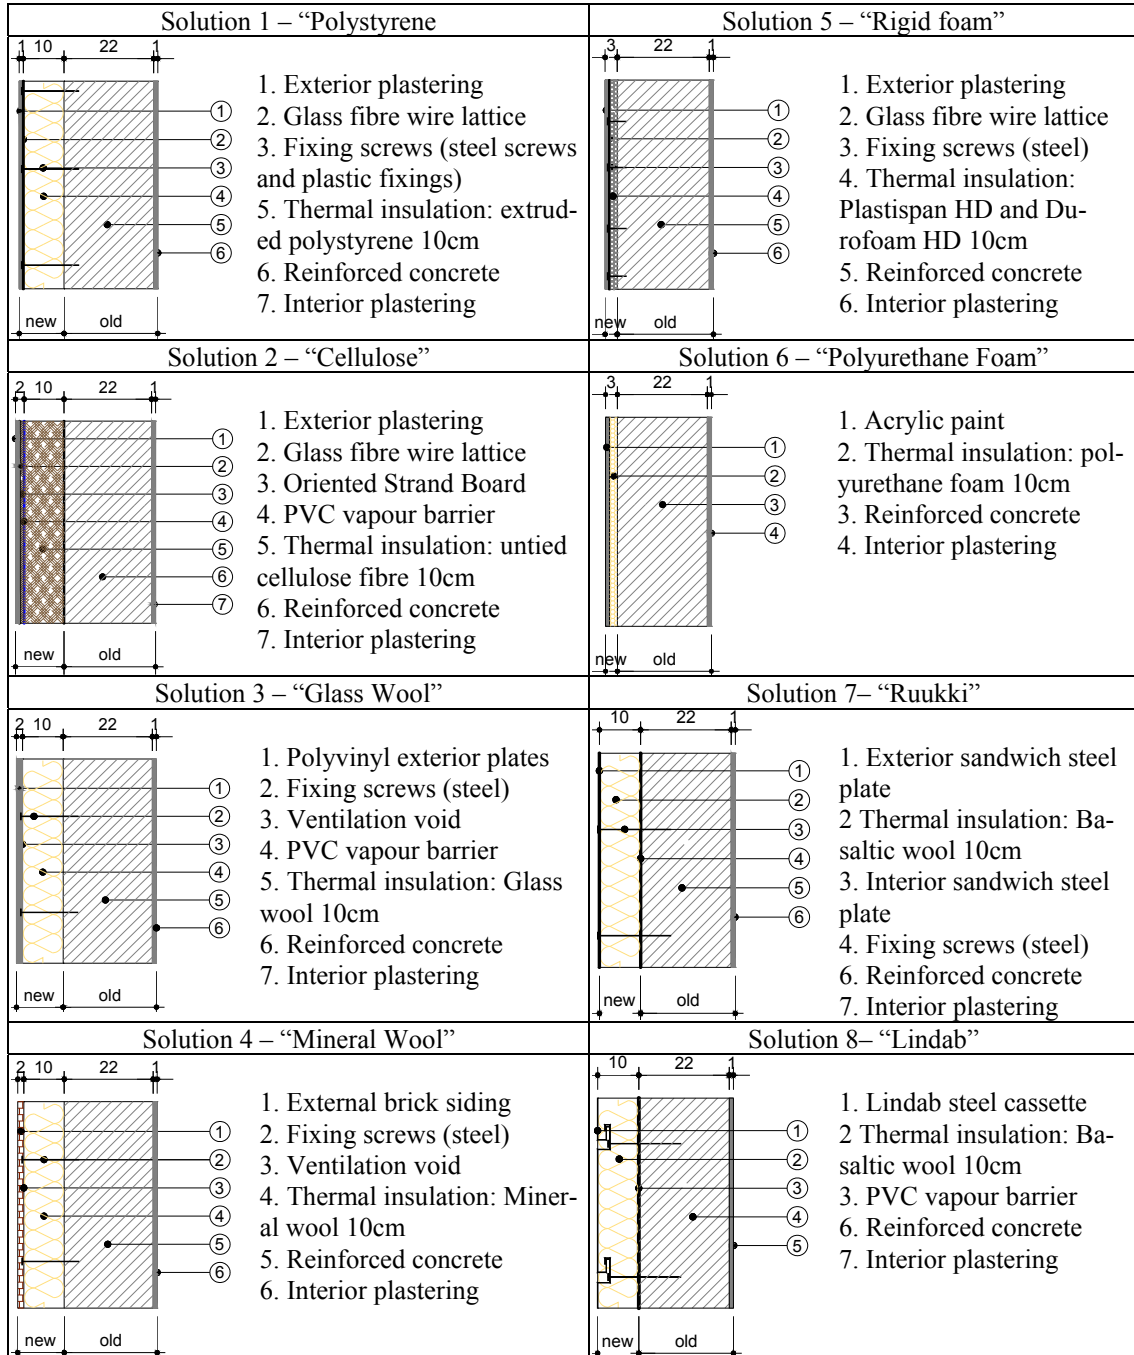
Solutions for thermal retrofitting the existing concrete walls.
